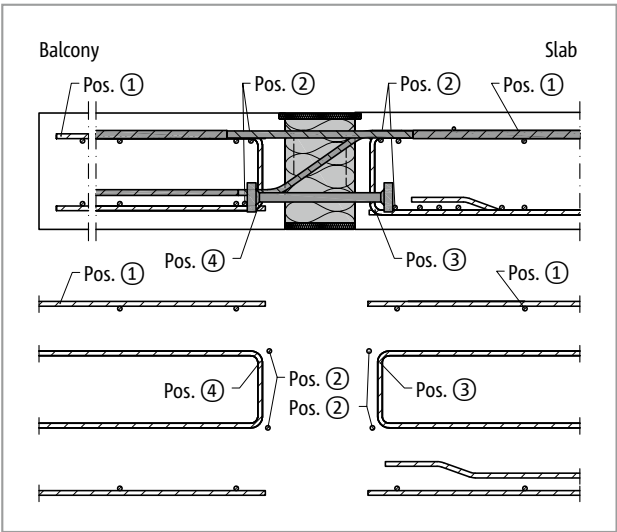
Schöck Isokorb® XT type K-M11: On-site reinforcement for indirect support
